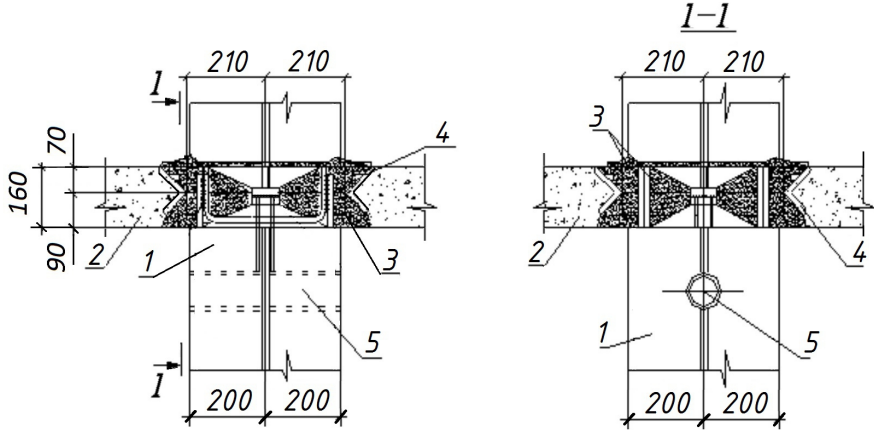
Structure of column drop-column connection: 1 – column; 2 – plate; 3 – concrete key; 4 – steel trim of a hole in the plate; 5 – hole for installation of hardware for plates mounting
